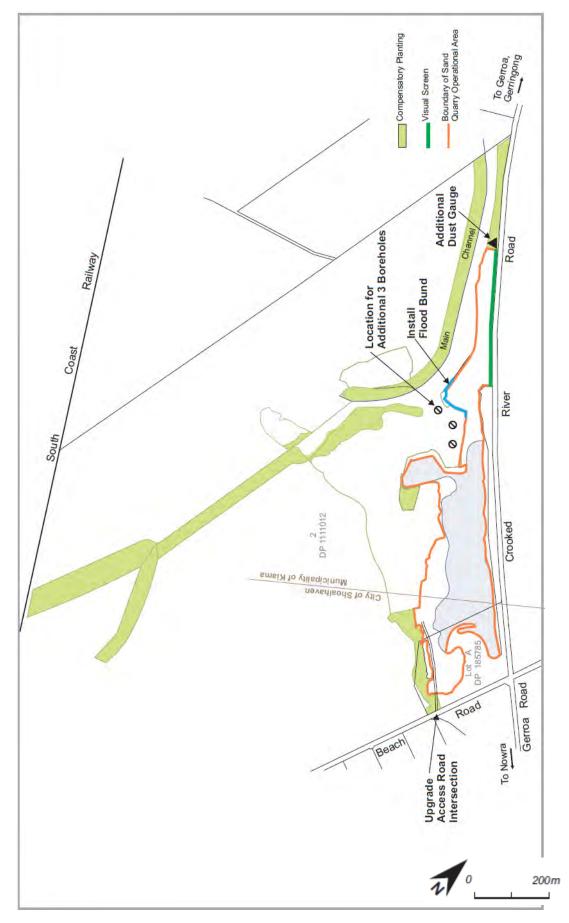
Location of Preparatory Works – note refers to old monitoring station locations
